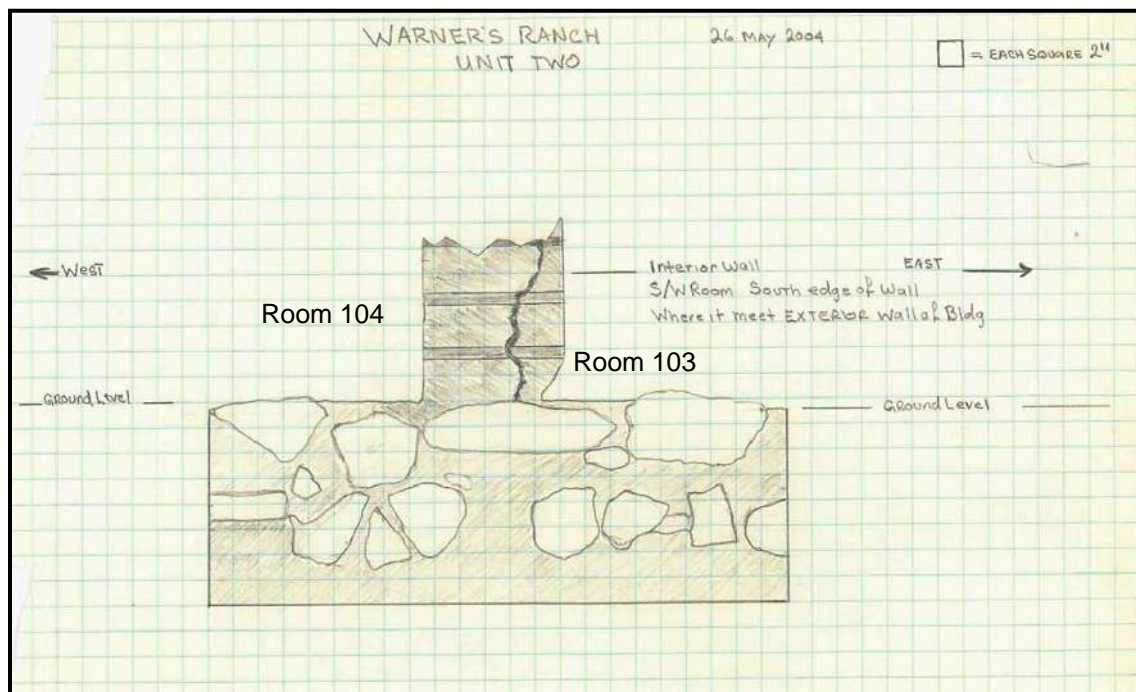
Profile drawing of the cobble foundation and the end of the western interior dividing wall in Unit 04-2.
